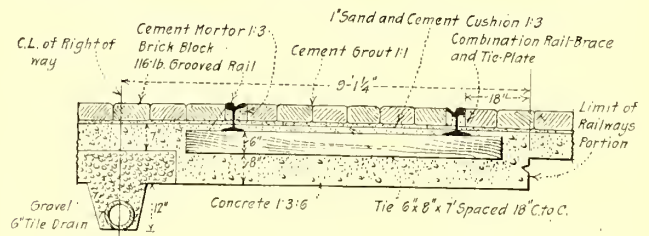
TRACK CONSTRUCTION ON HEAVILY-TRAVELED BUSINESS STREET
